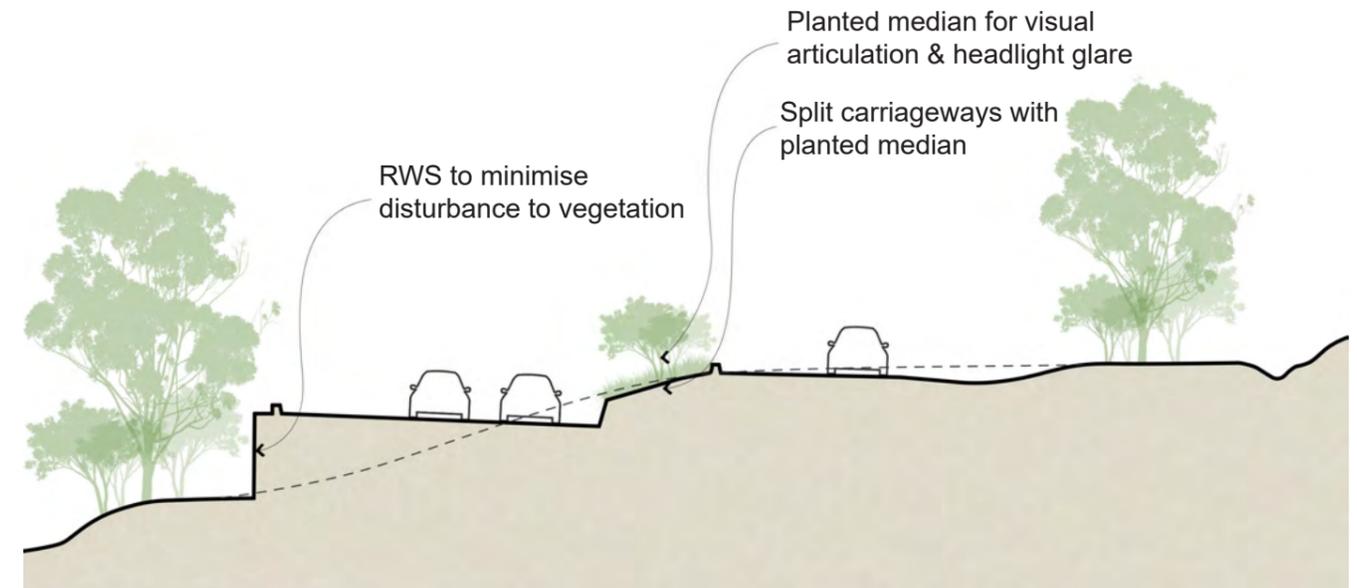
Split carriageways with use of retaining walls to maximise retention of existing vegetation and planted medians to articulate road and provide headlight glare reduction
